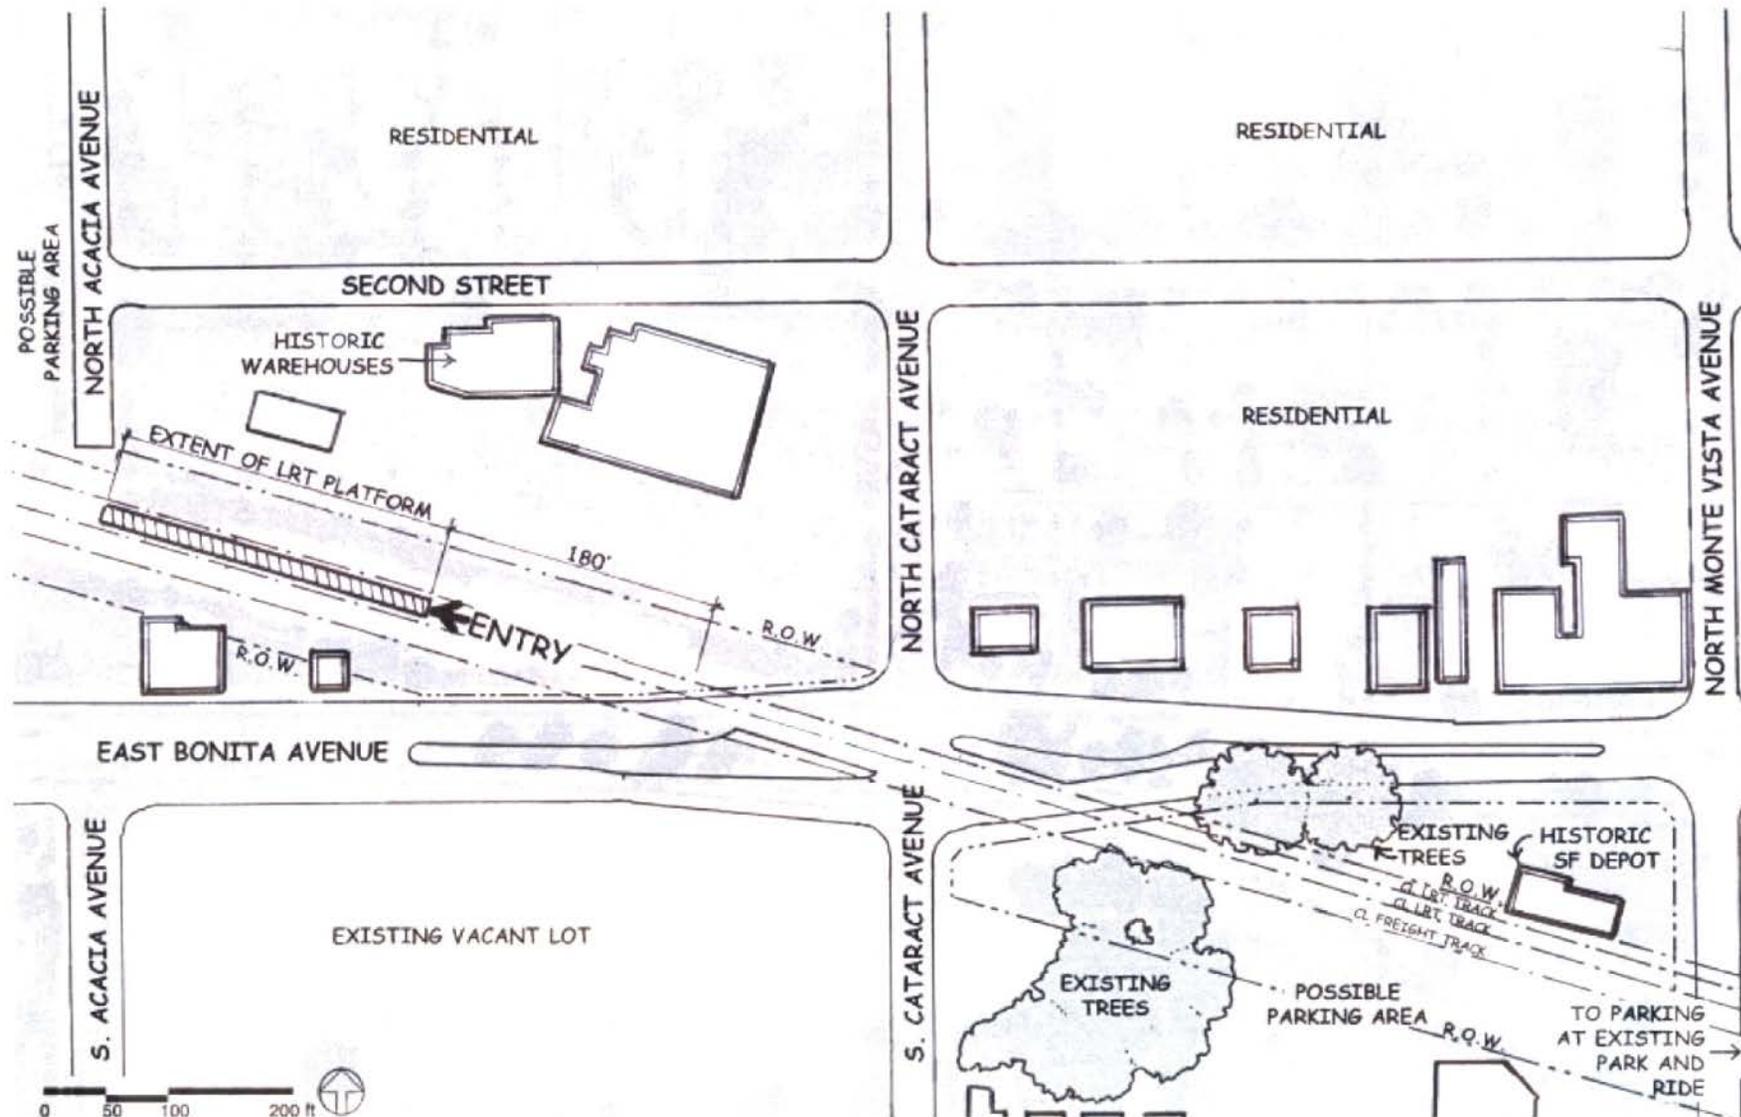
Site Plan: City of San Dimas Station, 3-Track Alternative
